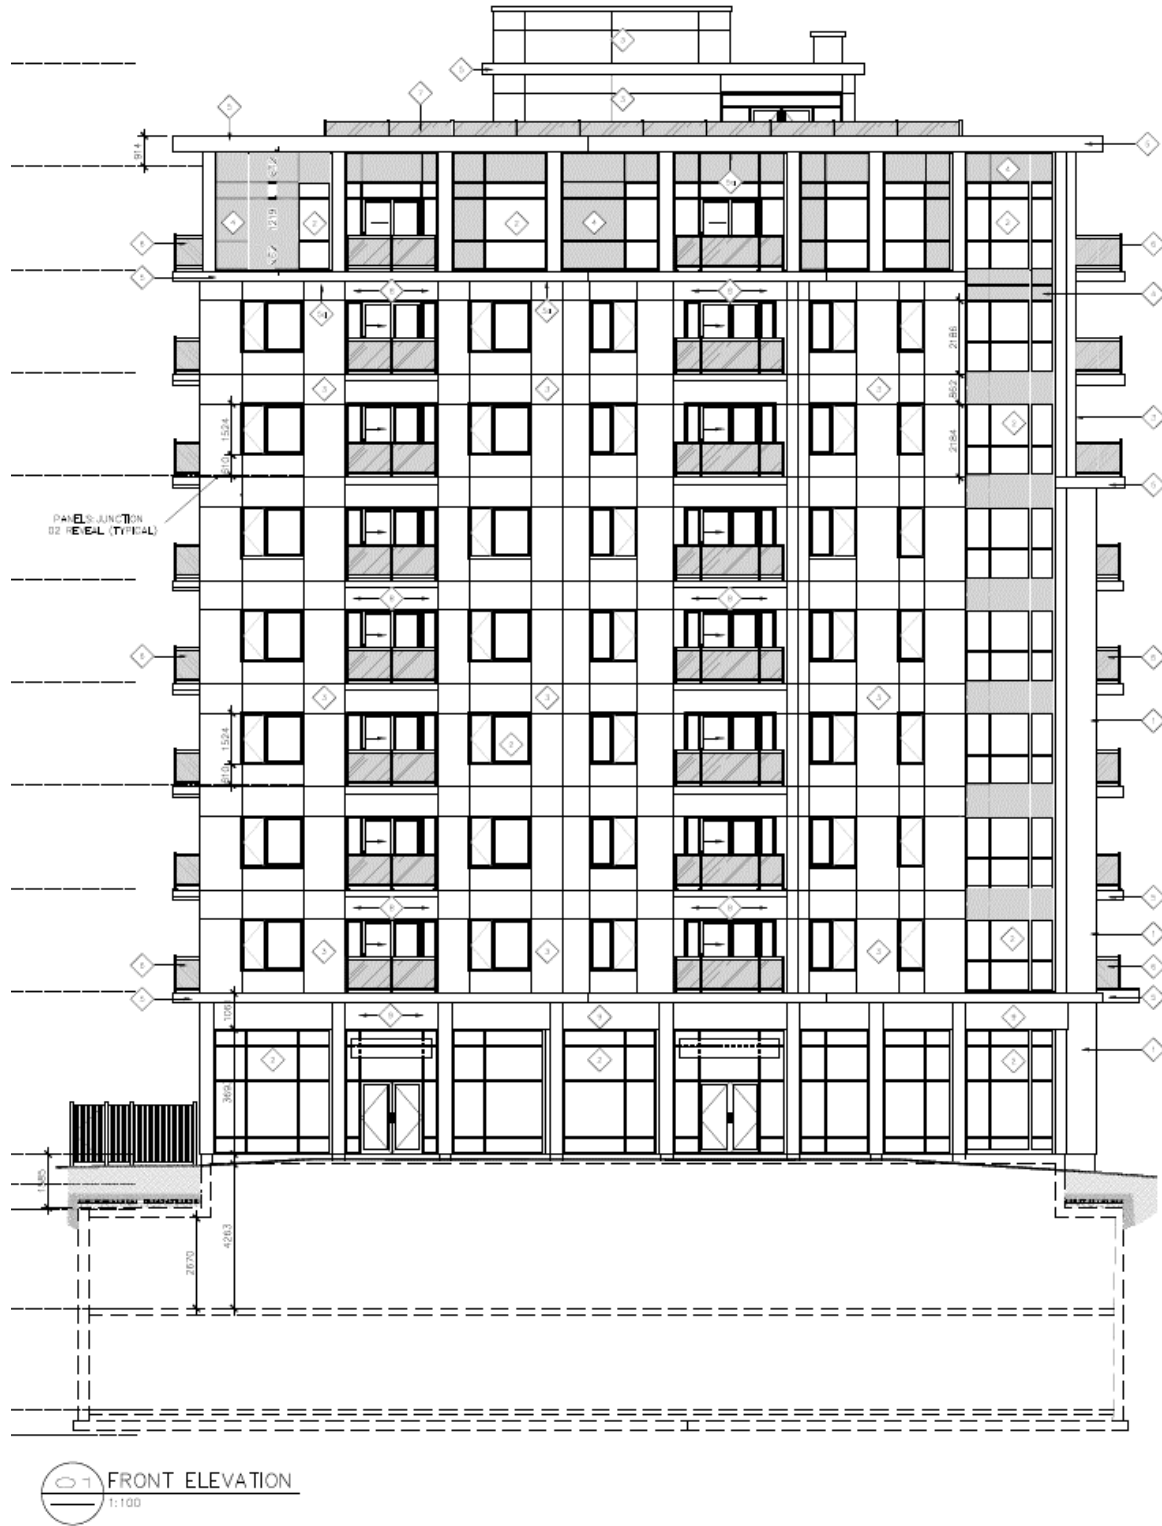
Proposed Building Elevation – South Elevation (Yves Lussier Architect, October 27, 2022)
